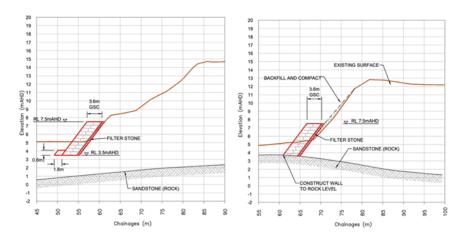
Concept Sketch of exposed GSC revetment showing cross section A (southern section, left) and F (northern section, right)
